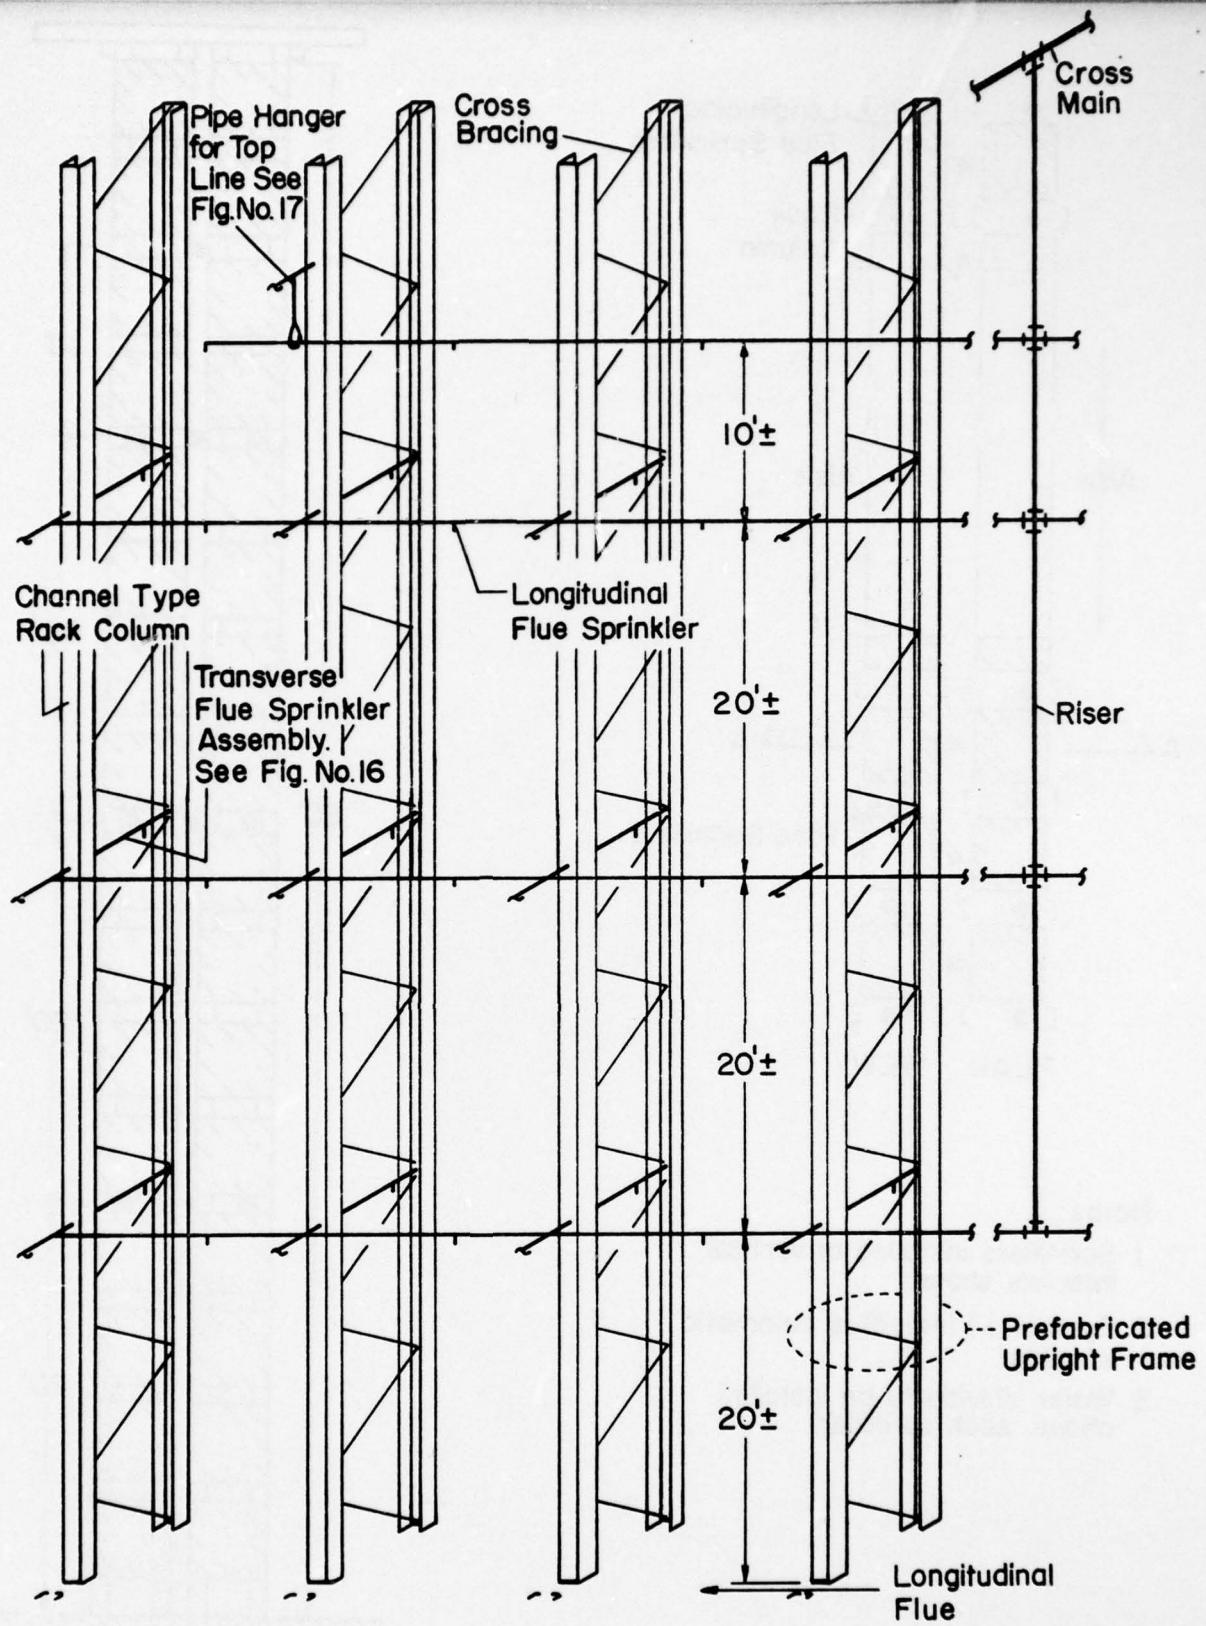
Pictorial Sketch of Integrated Sprinkler System Utilizing Standard Circular Pipes.
